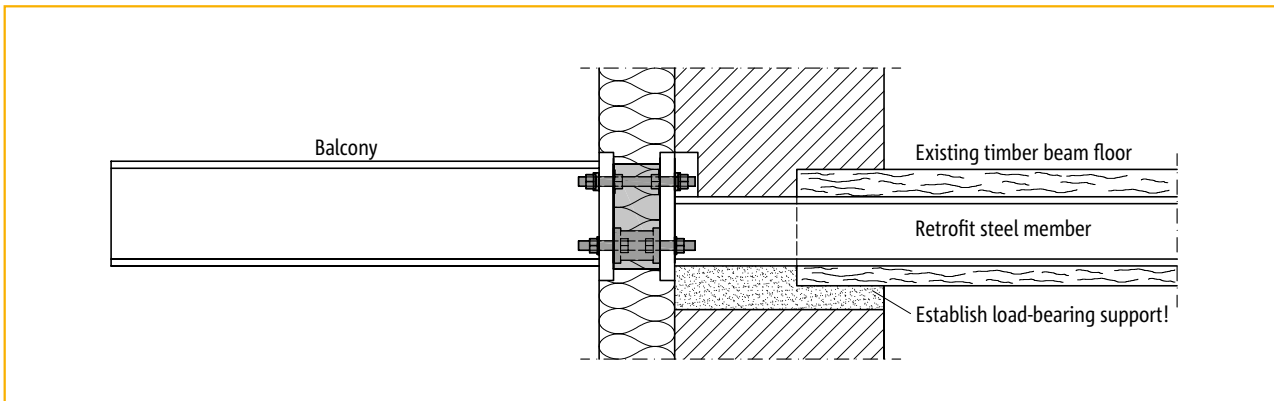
Balcony freely cantilevered, connected with type KST on timber beam floor (steel balcony)
